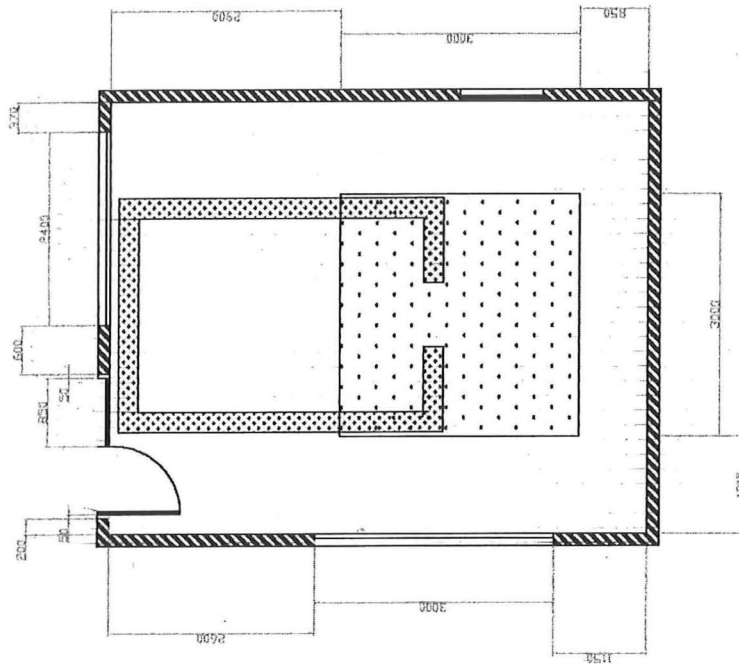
Plan of School of Engineering Fire Laboratory and the Location of Fire-test Room.
